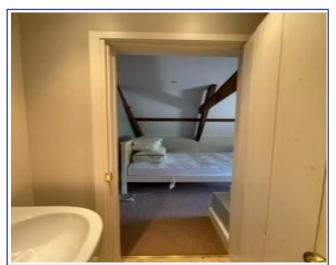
The Byre Bedroom 2 Ensuite Bathroom looking at south elevation and entrance to Bedroom 2.
